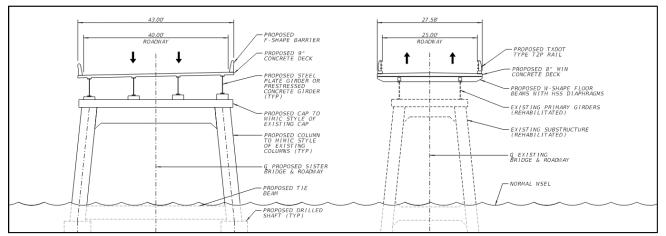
Alternative 3A Typical Section (Approach Spans – Not Showing Substructure Retrofits)
